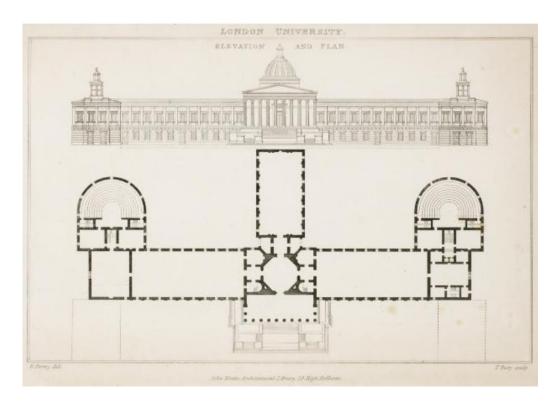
Early Plan of the Wilkins Building (UCL College Archives, n.d.)
